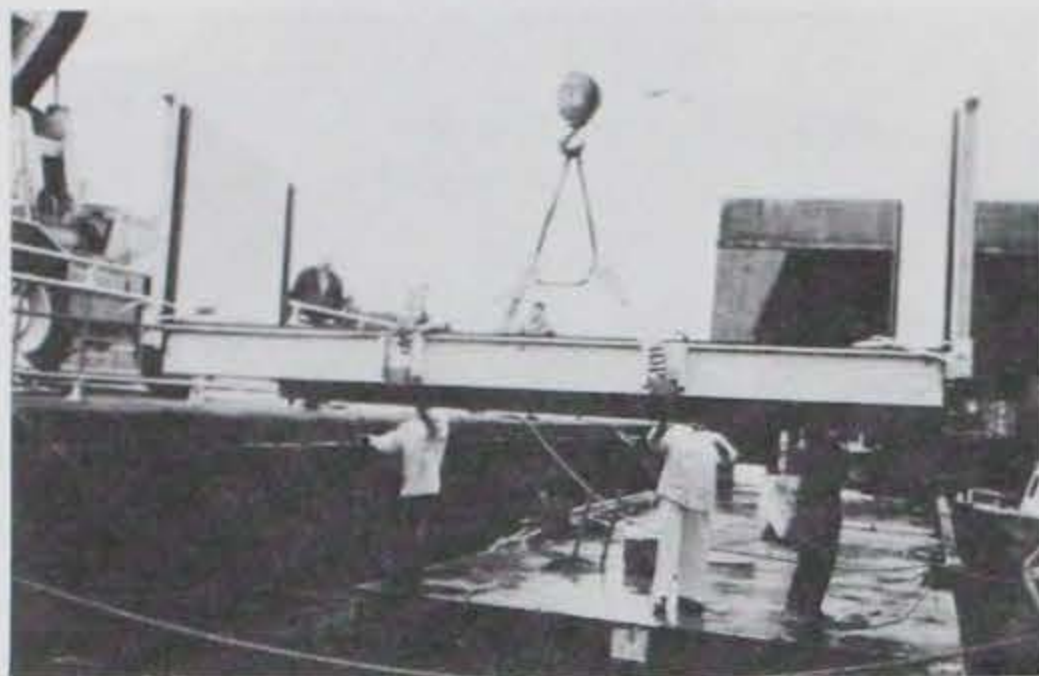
A wood cofferdam being placed to allow work to be done in a dry environment.
